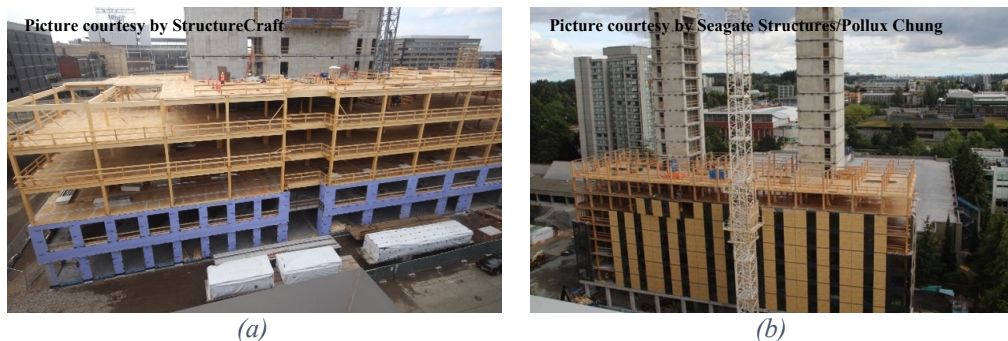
Hybrid heavy timber constructions. (a) T3, office building, Minneapolis, MN (b) Brock Commons, residential building, Vancouver, BC.
